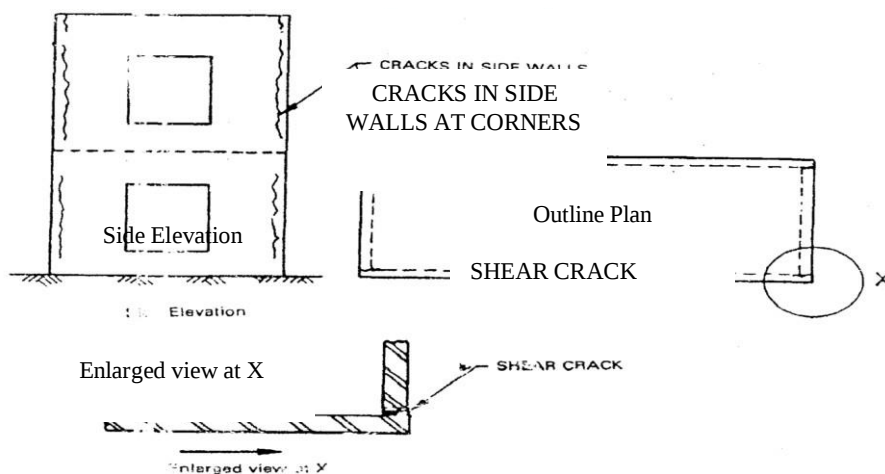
Vertical cracks at corners in the side walls of a long building due to thermal movement
